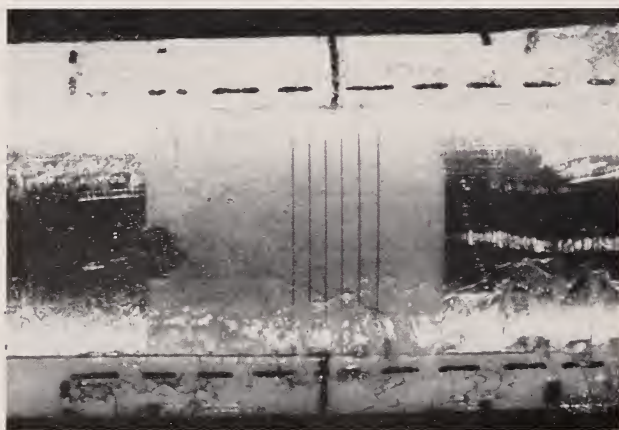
Central section of test specimen with enlarged view of a part of the transverse gage.
